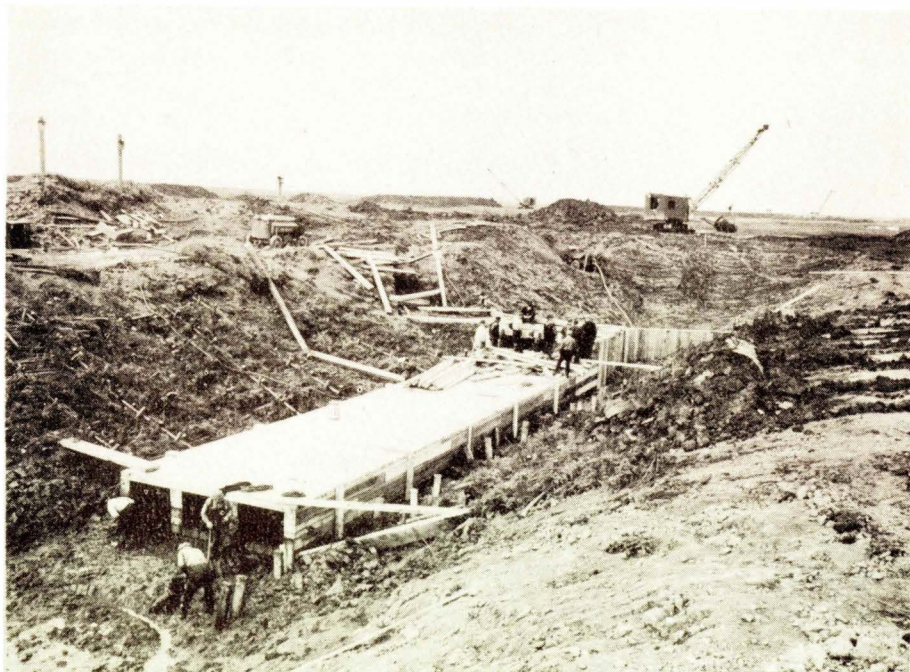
Project N. S. 42, Amherst Point Marsh, N. S. This is a view of a large aboiteau sluice being installed on a section of marsh which was not protected by dykes and aboiteaux. New dyke under construction may be seen in the background. The installation of this structure was carried out under trying conditions and it afforded the development of special installation techniques.
